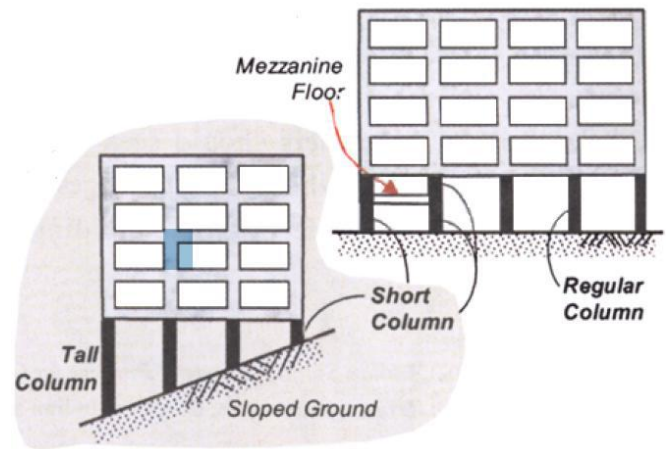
Buildings on a sloping ground and buildings on a plane ground
